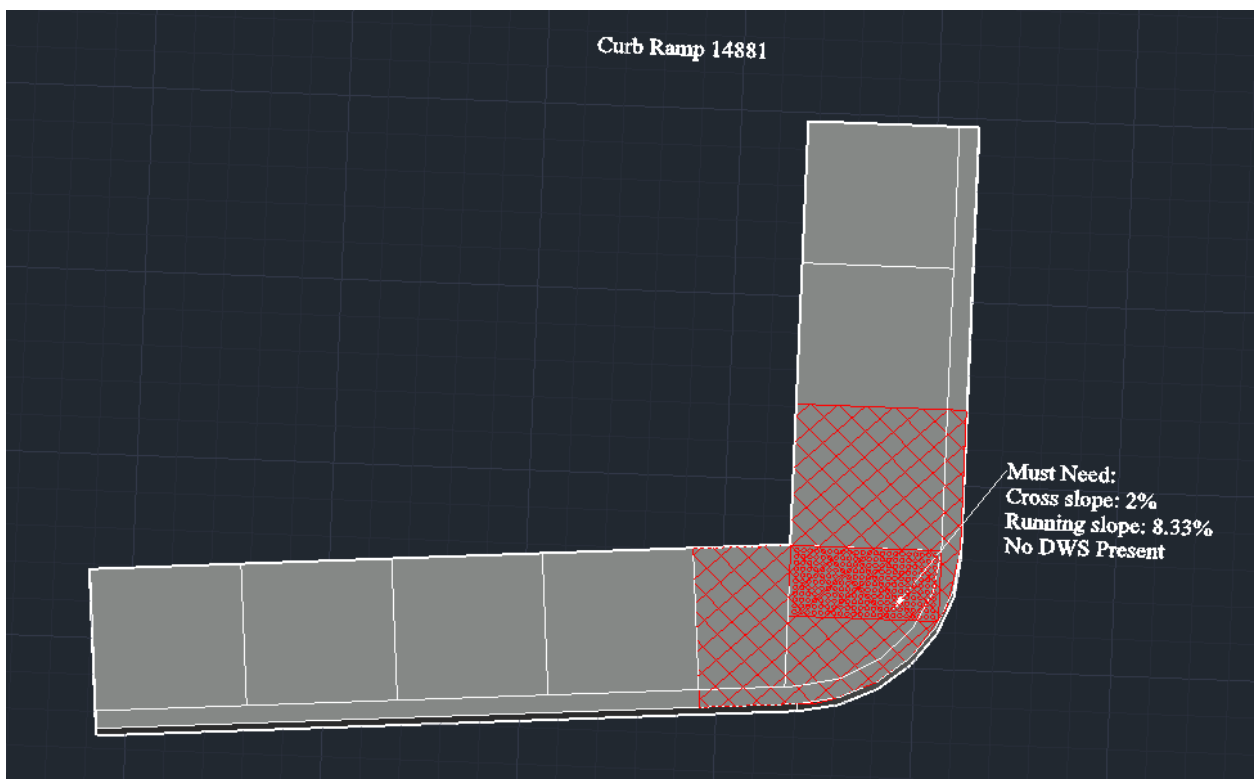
Proposed AutoCAD model of Curb Ramp i at Intersection D.
